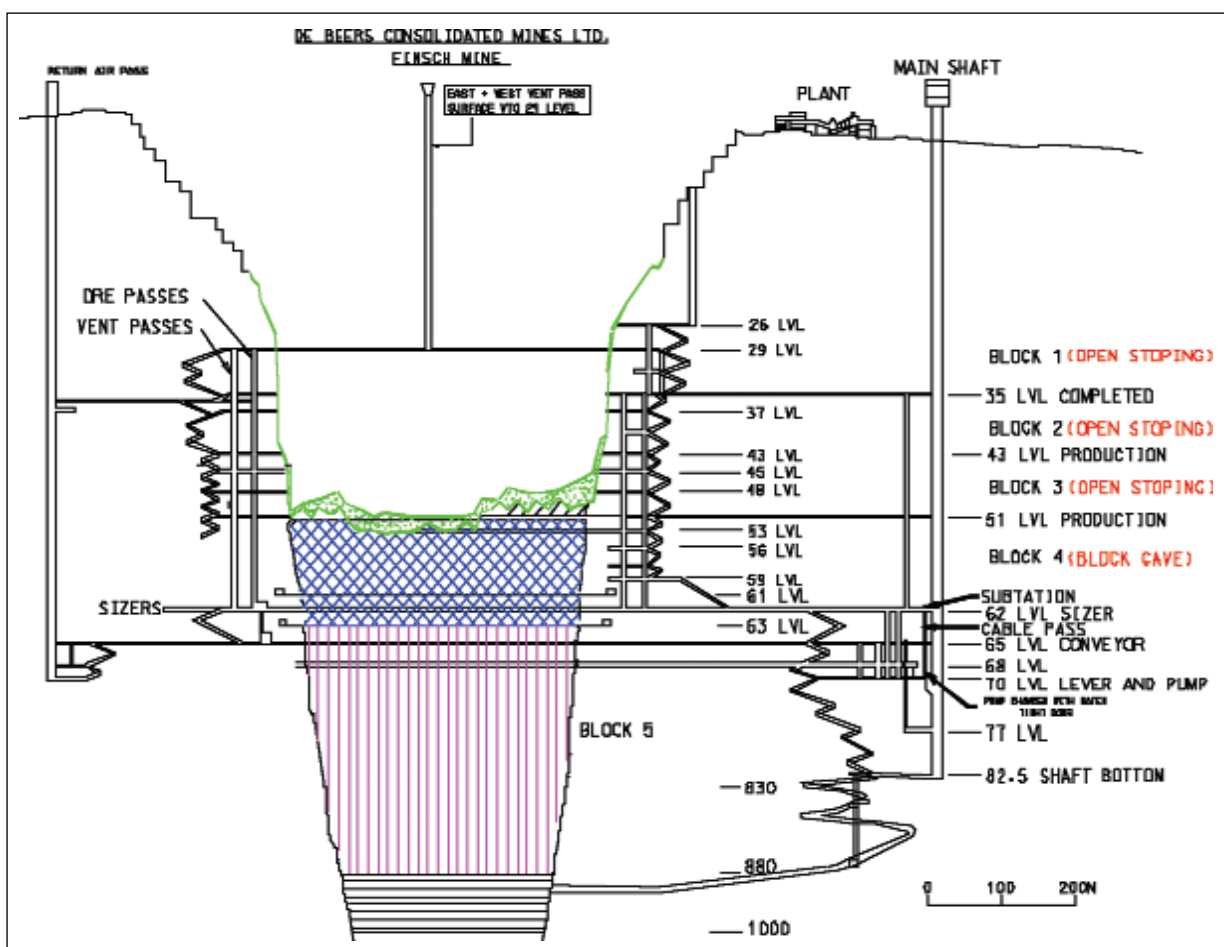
Section view through Finsch Diamond Mine, illustrating its mining layout of pre-2015 mining activities (Preece & Liebenberg, 2007).
